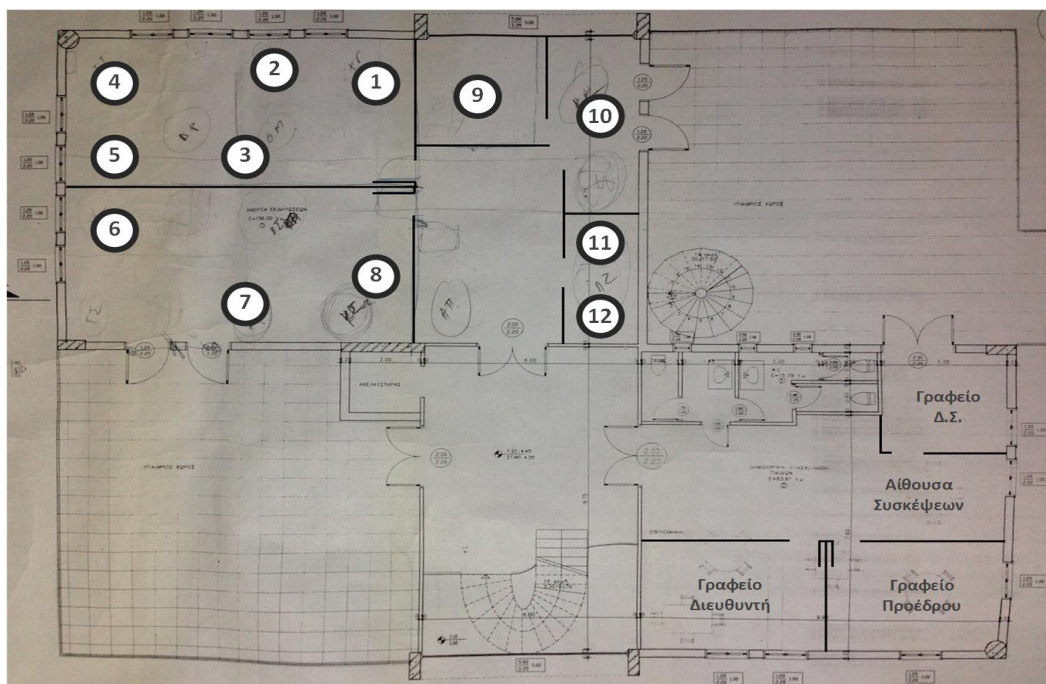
Measurement points on the first floor of the building ADEP SA.
